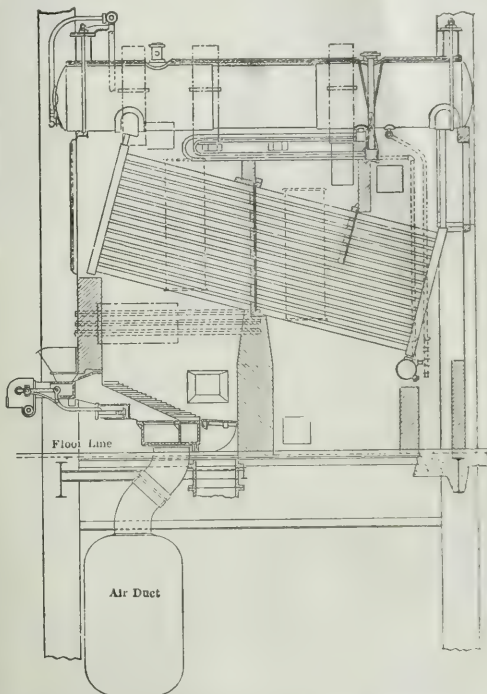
CROSS-SECTION OF BOILER EQUIPPED WITH STOKER.
